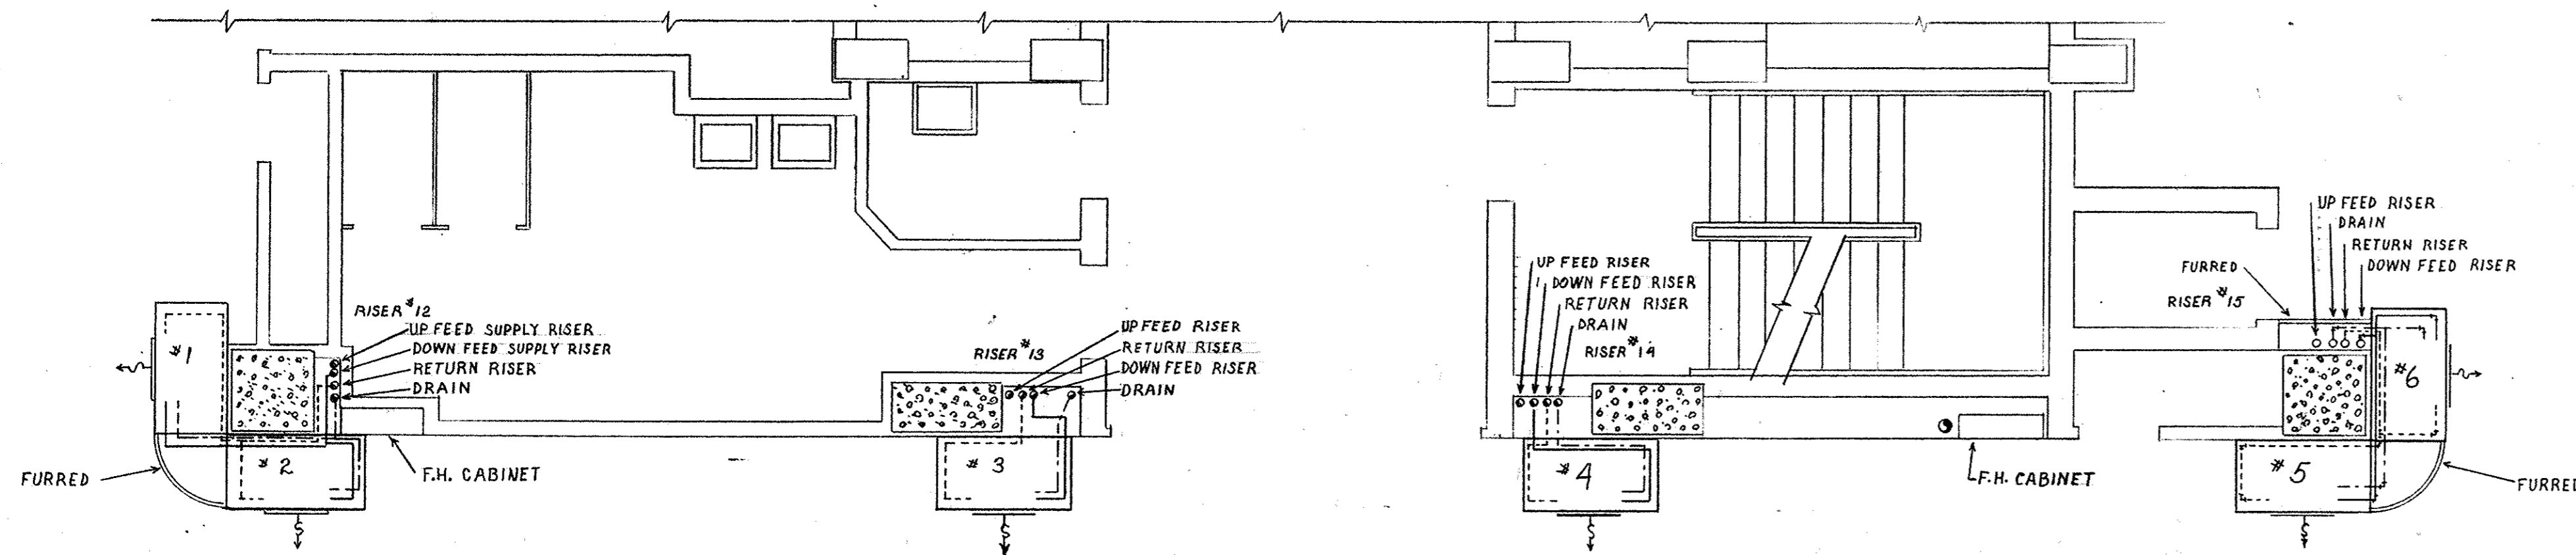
DETAIL OF SECOND FLOOR A/C UNITS NORTH WALL
